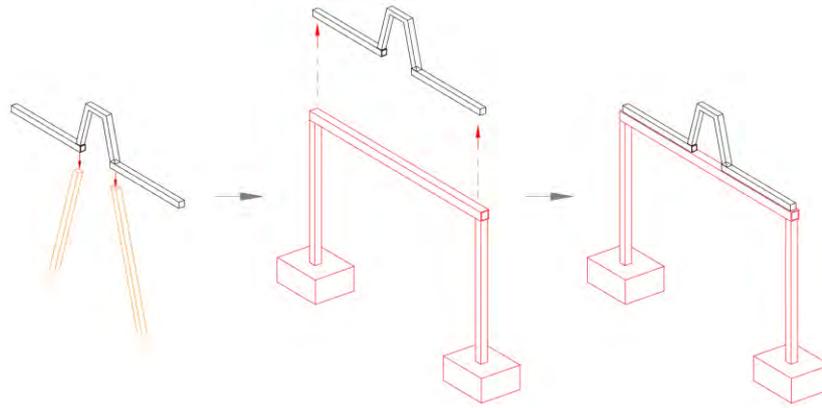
Removal of existing canopy structure and construction of new canopy and foundations
